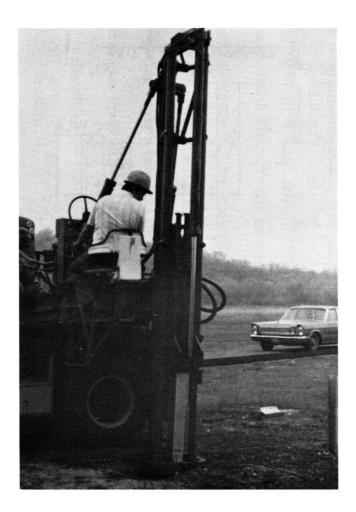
STERLING ENGINEERING COMPANY - POST DRIVER
